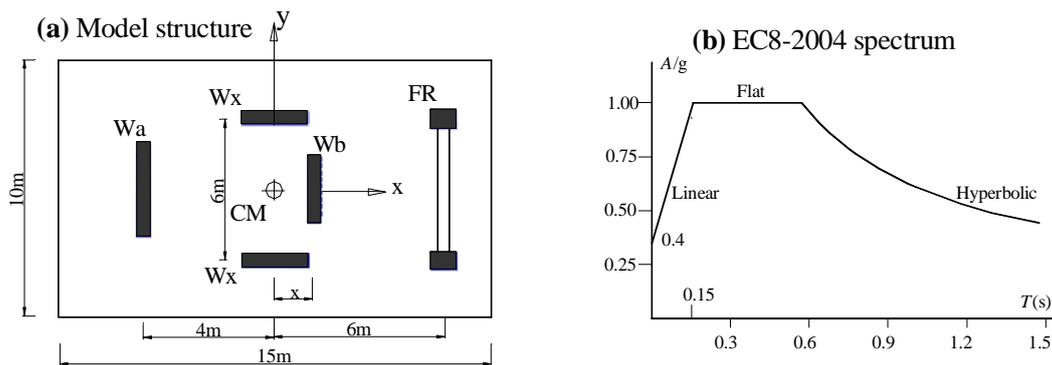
(a) Floor plan of example structure; (b) Code-recommended design spectrum
